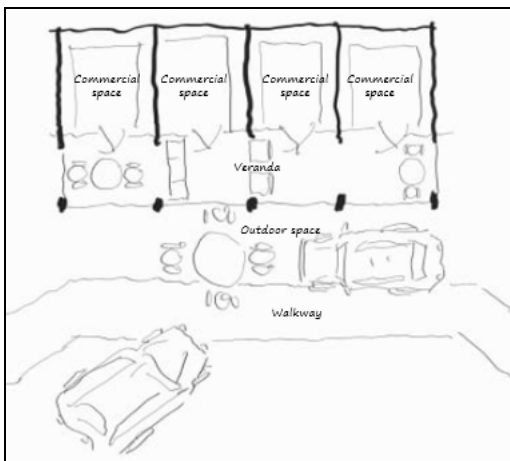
(Left to right): An outdoor space and walkway encroached upon to accommodate parking space (source: author, 2021).
